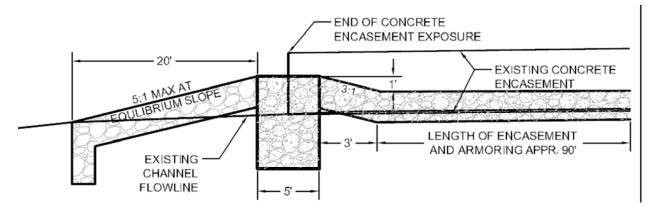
Concept Profile of Proposed Drop Structure and Channel Armoring between Stations 35+70 and 34+55.
